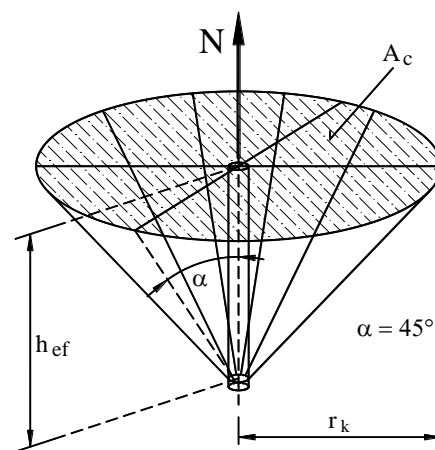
idealized failed form of concrete specimen in case of the Concrete-Cone Method (the anchorage depth equals the radius of the cone base)
